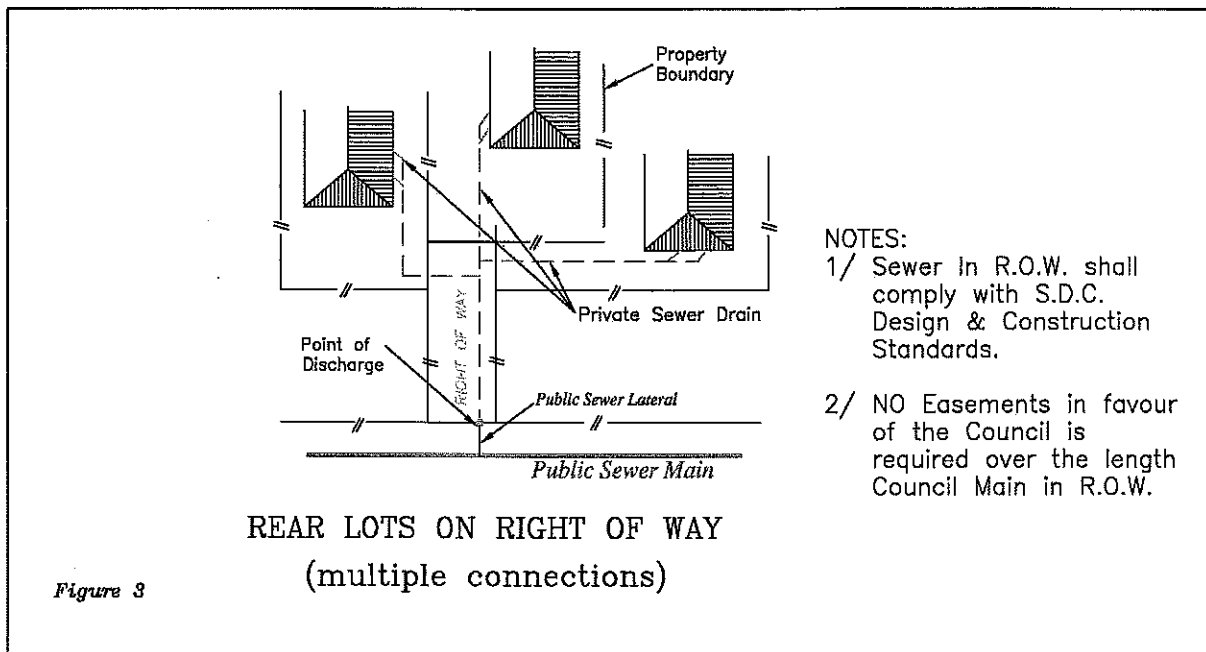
Typical layout at point of discharge – Individual customers multiple connections rear lots on Right of Way – No easement required.
